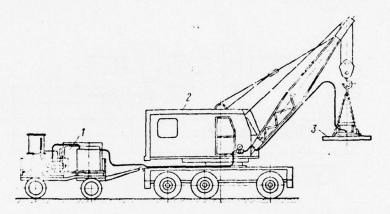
Chart: experimental vacuum slab layer: 1 - trolley and vacuum pump; 2 - crane and vacuum gripping device; 3 - slab
